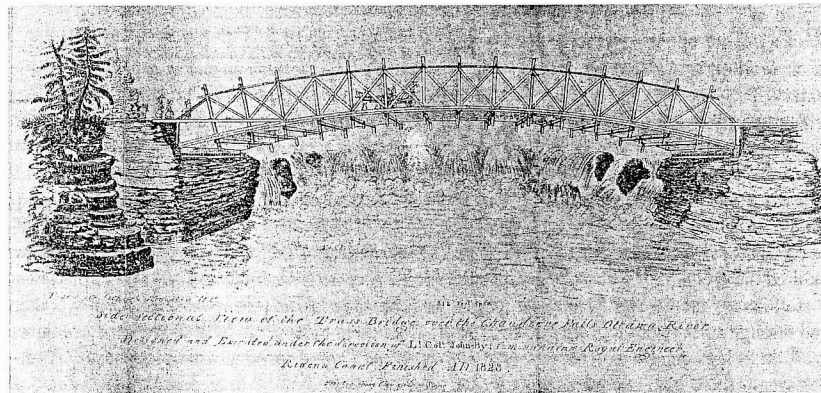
View of Colonel By's Wooden Bridge. Engraving from sketches by John Burrows (Queens University, Special Collections, Kingston, Ontario).
